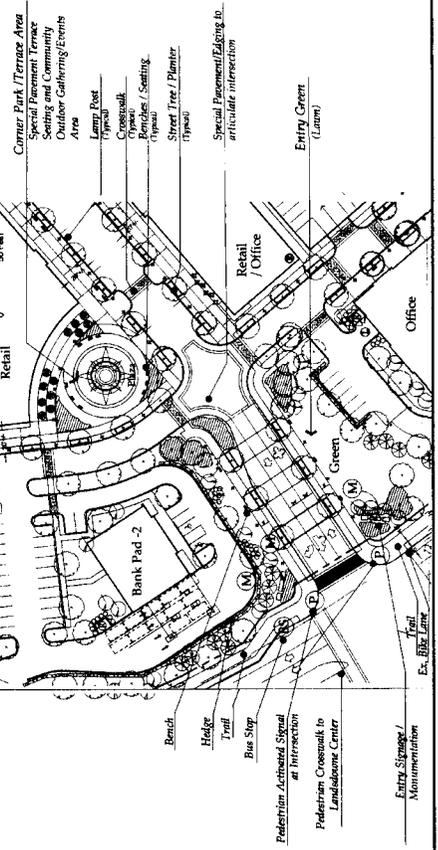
Detail D: Landscape Edge at Parking Beulah Street Frontage
